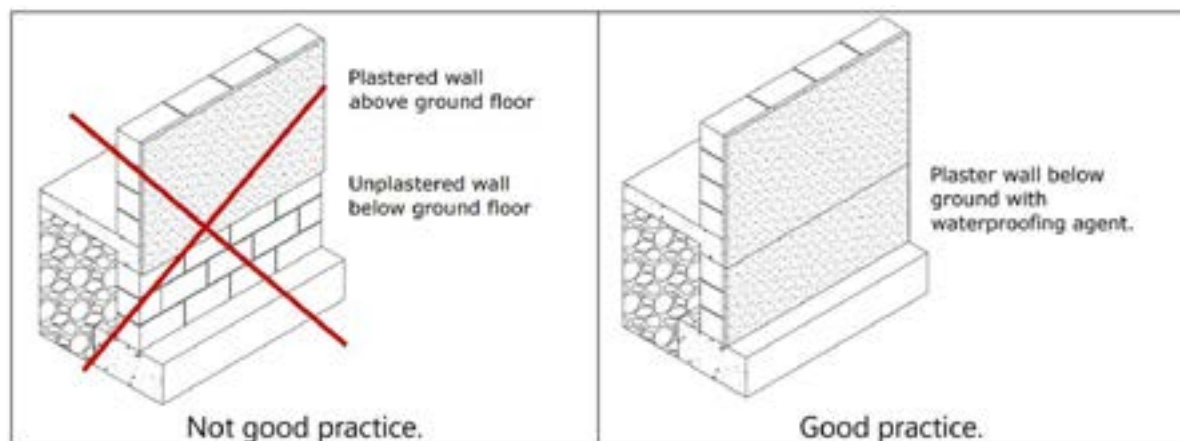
PLASTER THE WALL TO THE FOOTING
